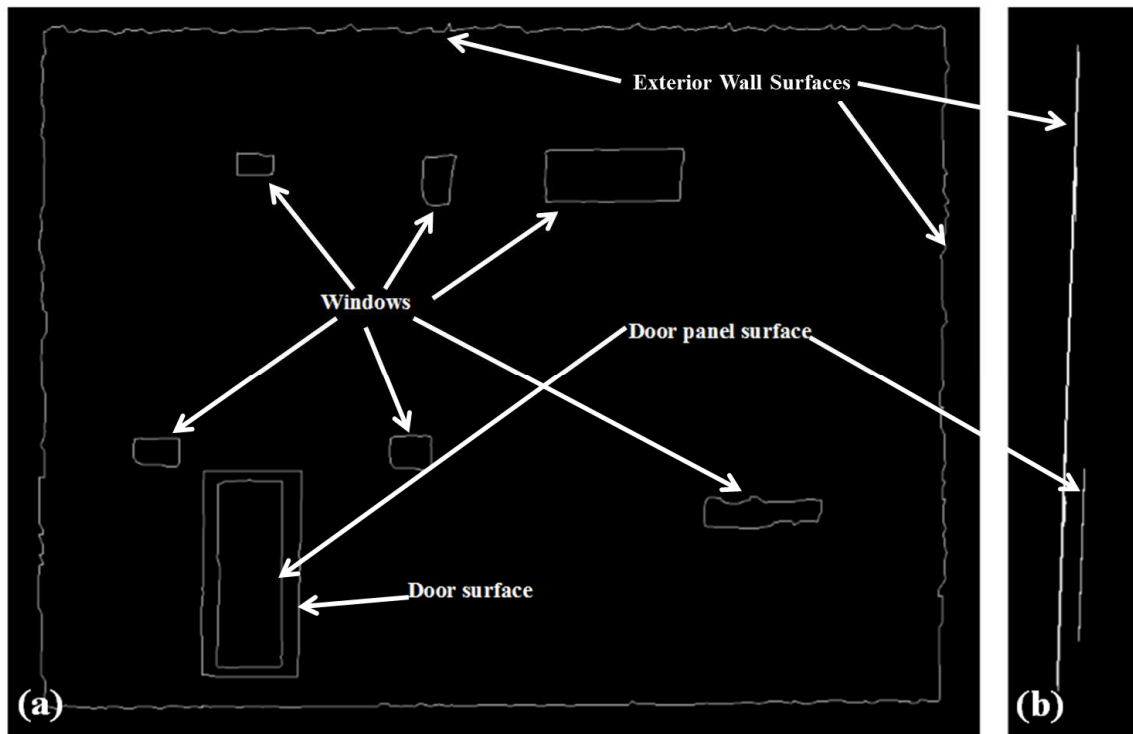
Exterior wall surface and door panel surface (a) Front view. (b) Side view
